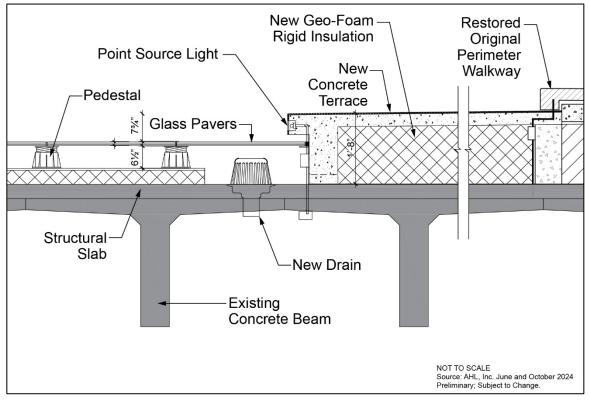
PEDESTAL-GLASS PAVER ASSEMBLY CONCEPTUAL CROSS-SECTION
